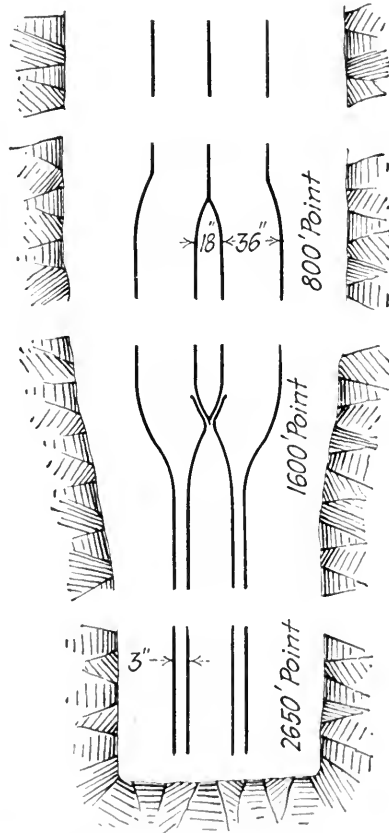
ECONOMIZING EXCAVATION IN INCLINE DOUBLE-TRACK SHAFT.
